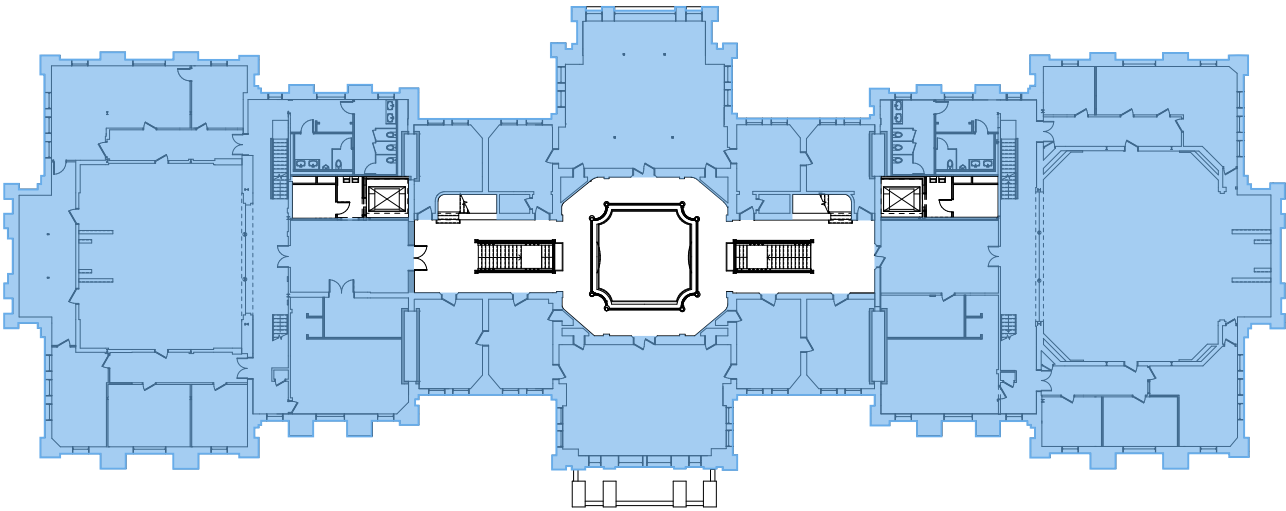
Proposed Space Allocation: Legislature and LSO - Second Floor [Capitol]
